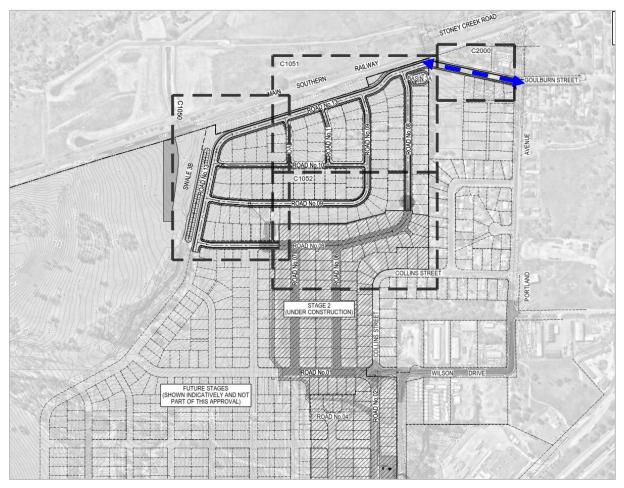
Northern External Access Point to Subdivision (Stage 3) - Goulburn Street
